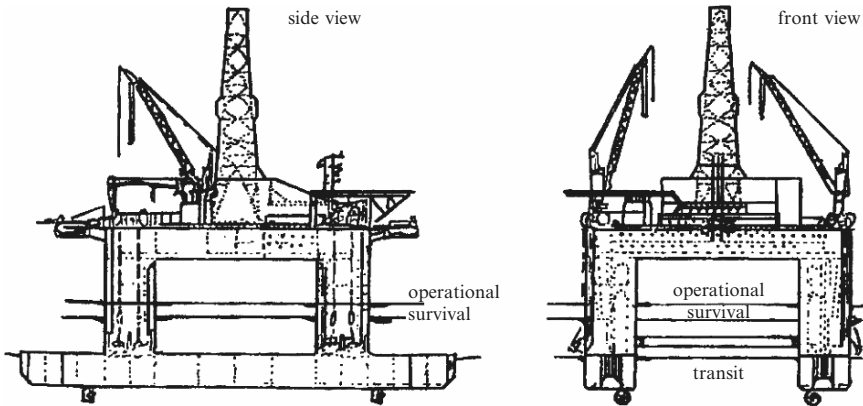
Layout of drilling semi-submersible DSS 40 (courtesy of DSS)
